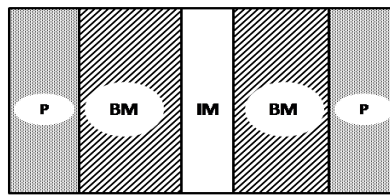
Configuration of composite wall. (BM: Building material, IM: Insulating material, P: Plaster)
